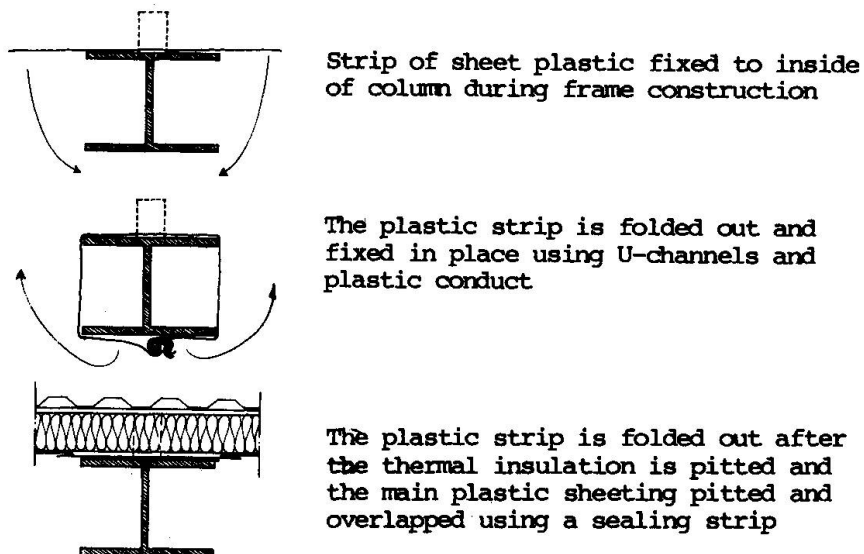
It can be difficult to place the plastic sheeting when steel columns are placed inside the facade. A strip of plastic sheet is therefore fitted directly after the completion of the frame and carefully fastened so as to avoid wind damage during construction. When the thermal insulation and the plastic vapour barrier are in place the strip is folded out to give a good overlap joint with the main plastic sheet.
